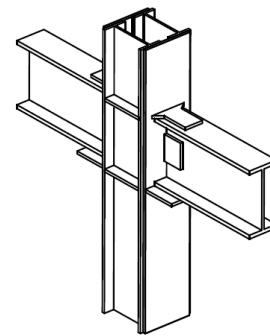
The common connections in Iran constructed using top and bottom plates with groove welding to column flange
